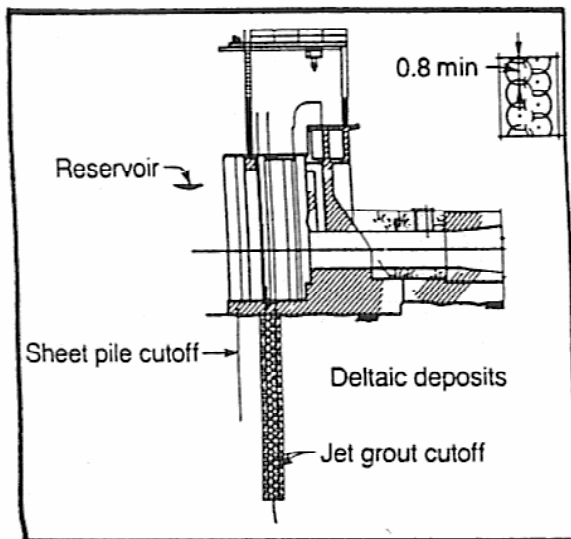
Jet grouting under concrete structure, John Hart Dam (87).
